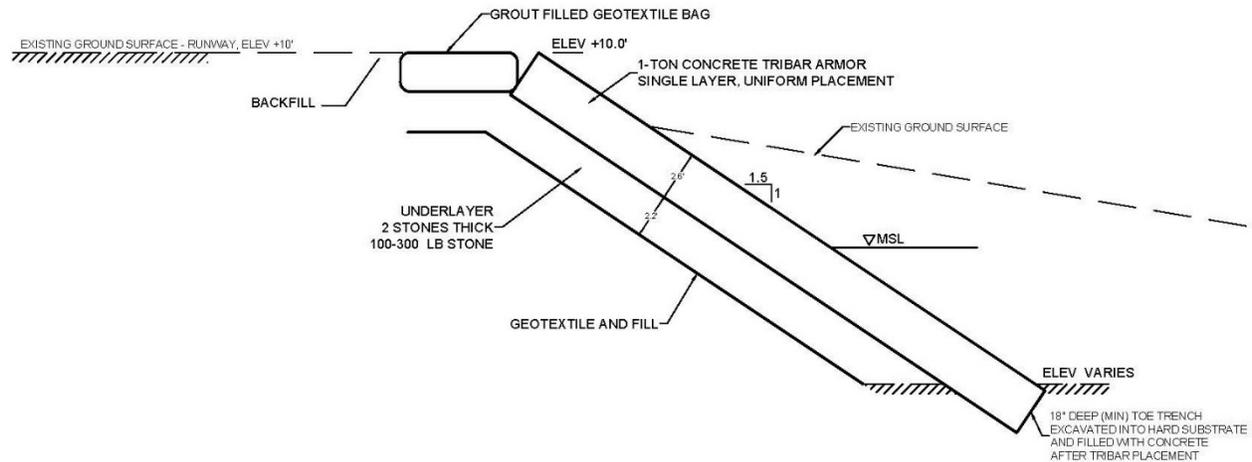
Alternative 2 - Preliminary Tribar Concrete Armor Revetment Cross Section
